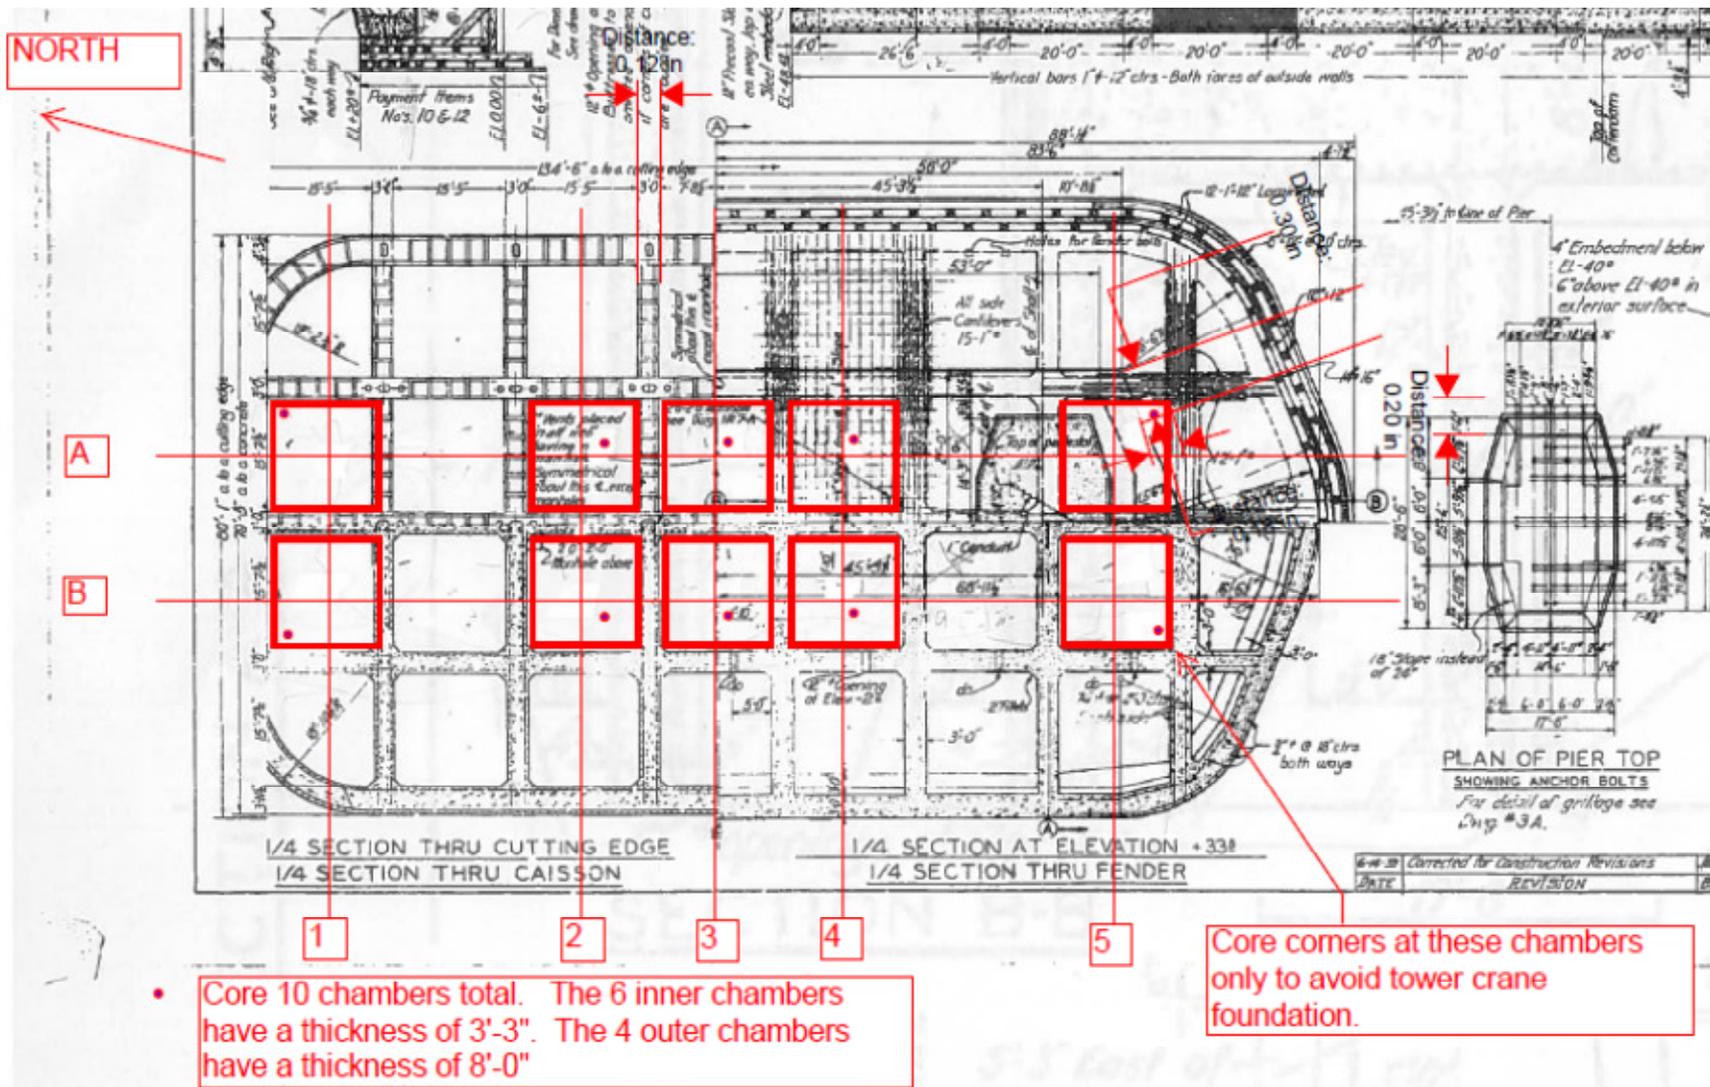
Plan View of Pier E3 Caissons and Water Quality Sample Locations (Source: EnviroSurvey, Inc., 2014)
